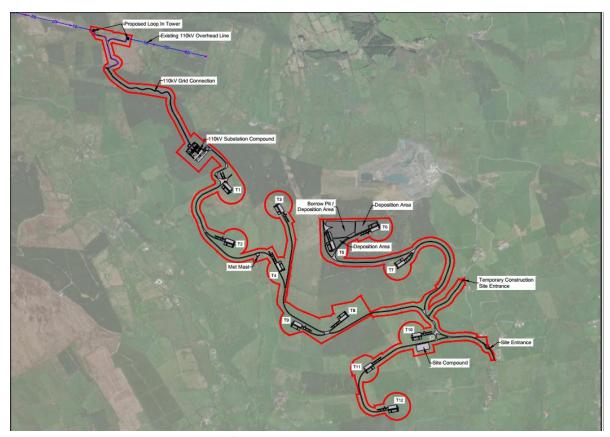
Site layout of the proposed Ballycar Wind Farm in County Clare.
